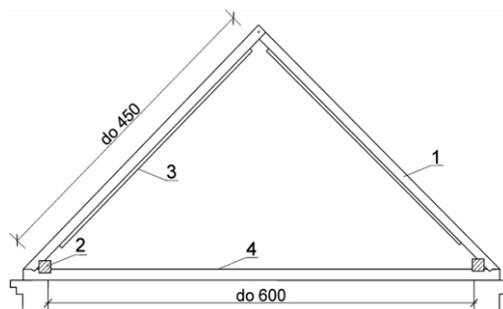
Rafter-“foot” purlin roof with main joist:
